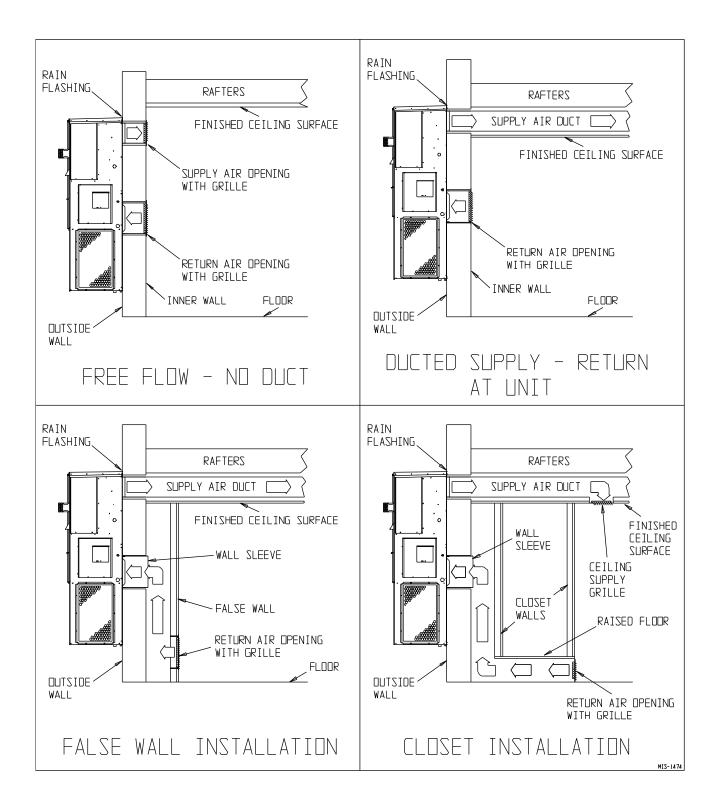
COMMON WALL MOUNTING INSTALLATIONS
